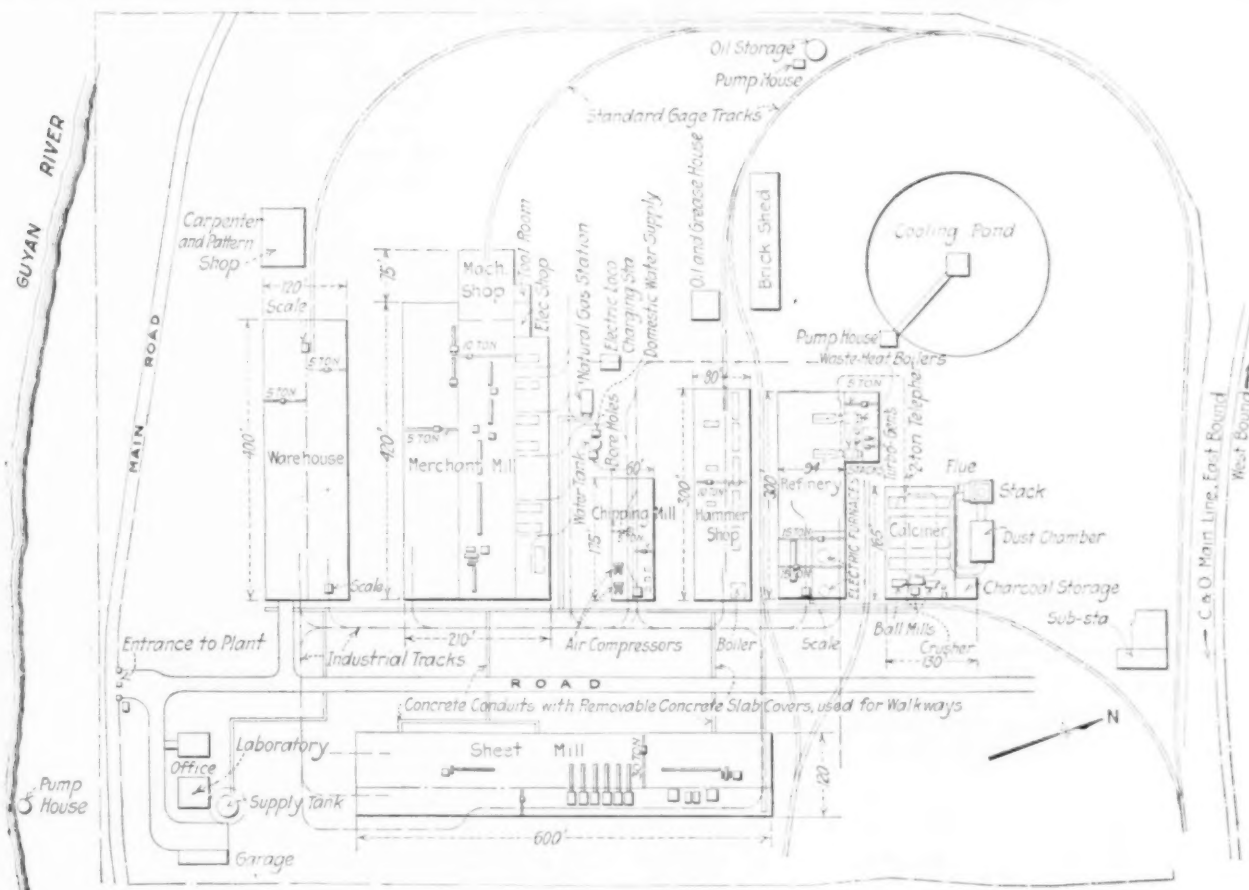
PLAN OF WORKS, SHOWING GENERAL ARRANGEMENT
